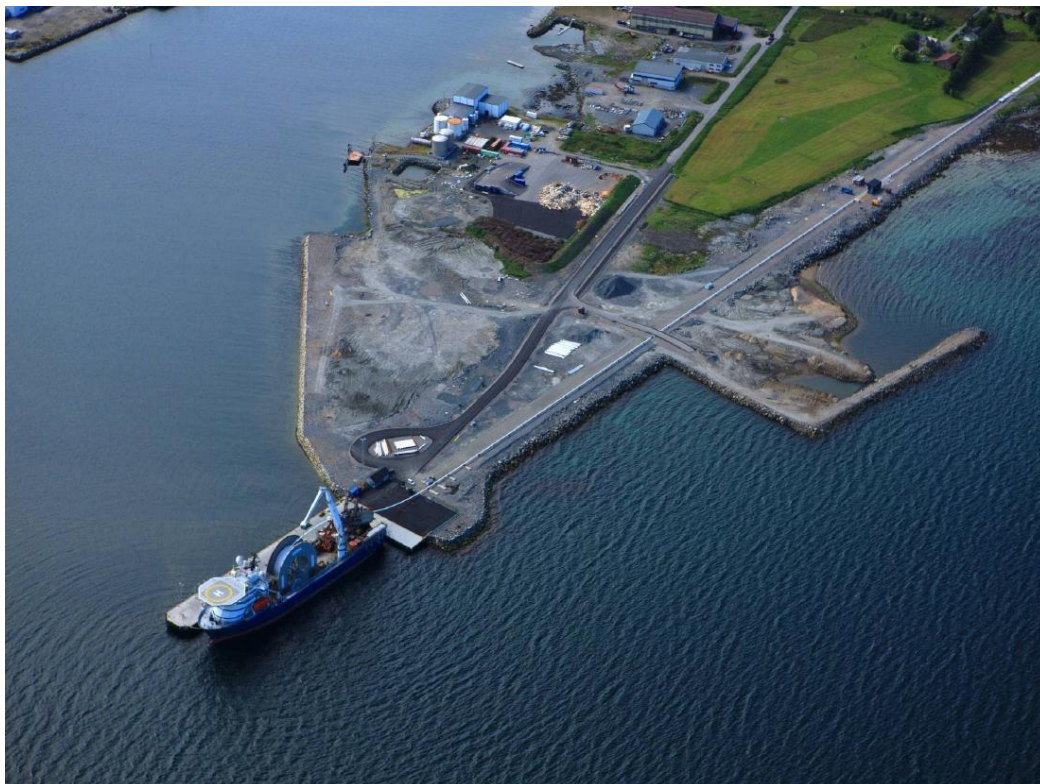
Typical onshore manufacturing site for reeling installation (spoolbase) (Ref., Pipeline and Riser Lecture notes, UiS, 2012).
